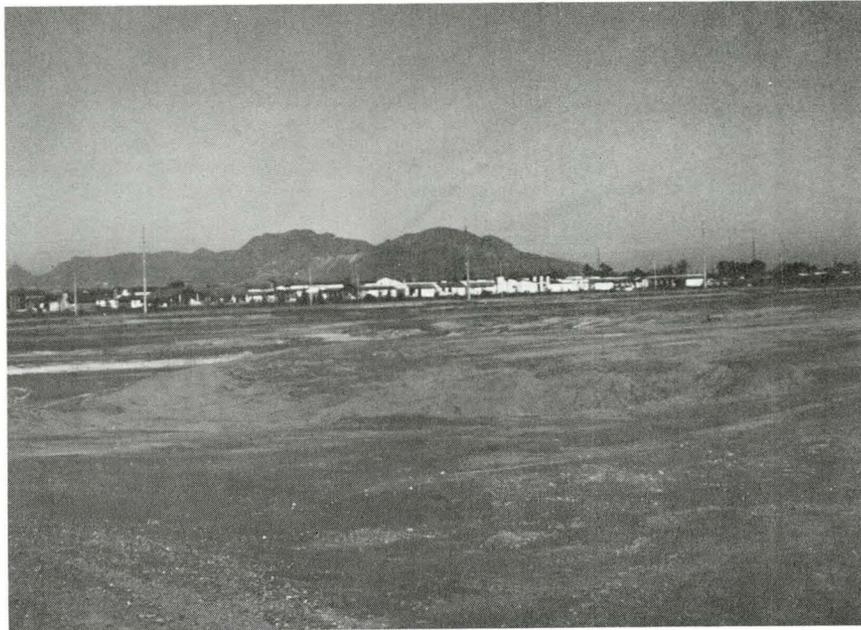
Looking northeast at the urban development just upstream from Indian Bend Road and the planned inlet structure. The McDowell Mountains are in the background.
